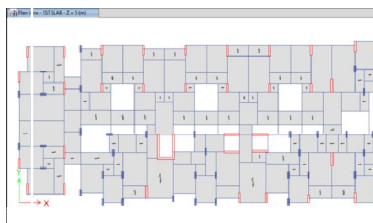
Typical Floor Plan of G+12 Residential RC Structure in ETABS
